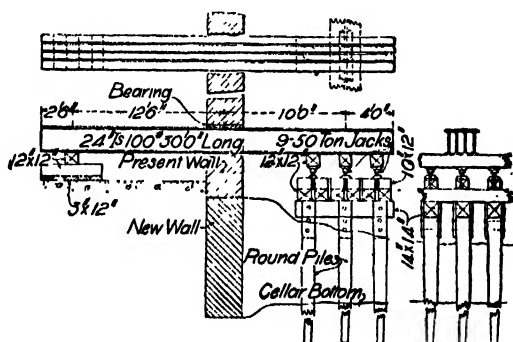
Underpinning with Needle-Beams and Pile Bents.
